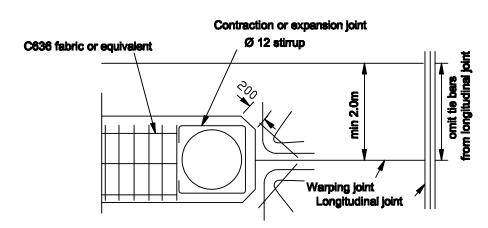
EXTRA JOINT AT MANHOLE POSITION TO BE A WARPING JOINT
